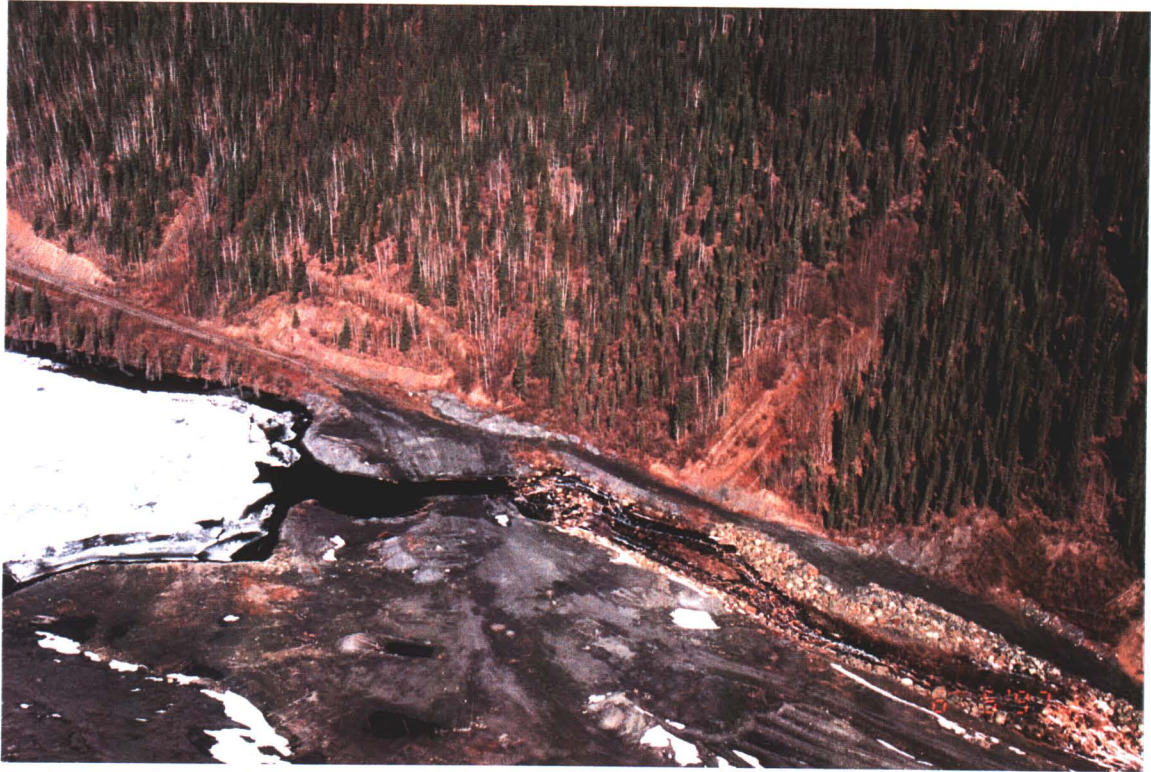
Photo I: Hudgeon Lake outfall - note channel, armoured, and weir at bottom right
